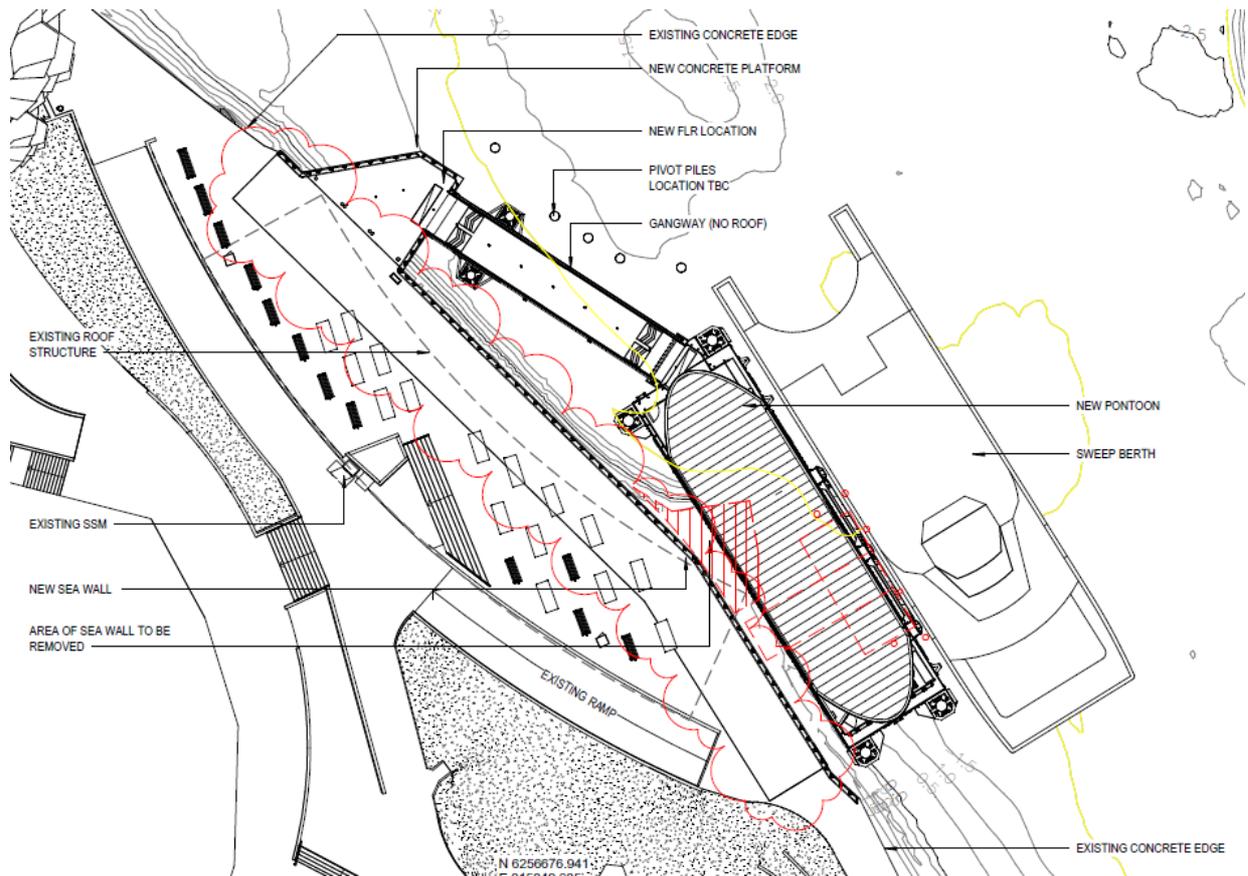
Proposed Parramatta Wharf design (Drawing AR-02-1000, Revision 4)
